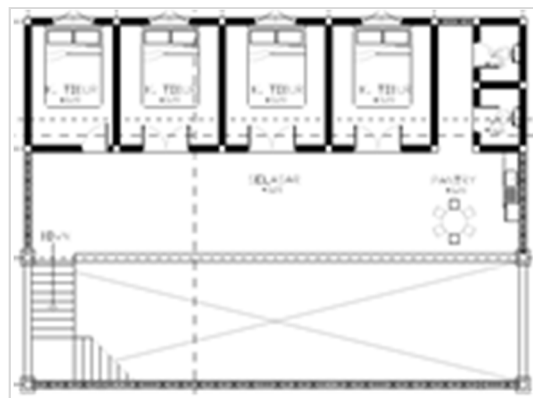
Adapted floor plan case study house 2 (2nd floor)
